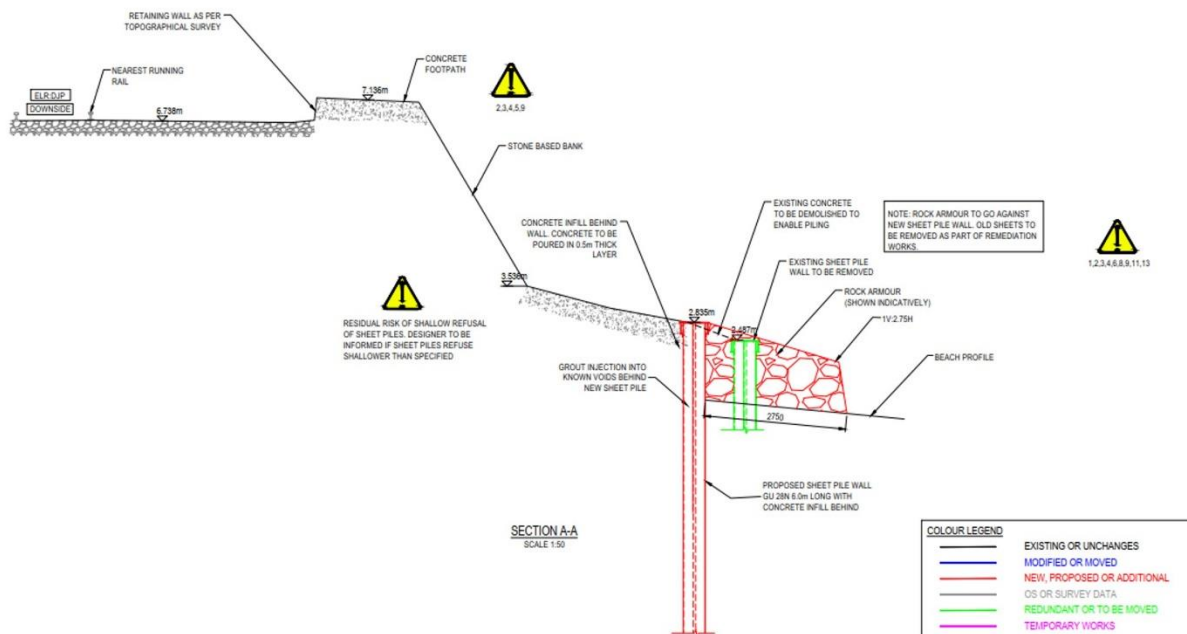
General Arrangement drawing section (profile view) - image capture taken from 'PROPOSED SECTIONS' created by Crouch Waterfall, Project Number: 23162B / Drawing Number: 001 - Revision B03, dated June 2023, provided by Daniel Overson (MPH Construction) on 23rd February 2024.
